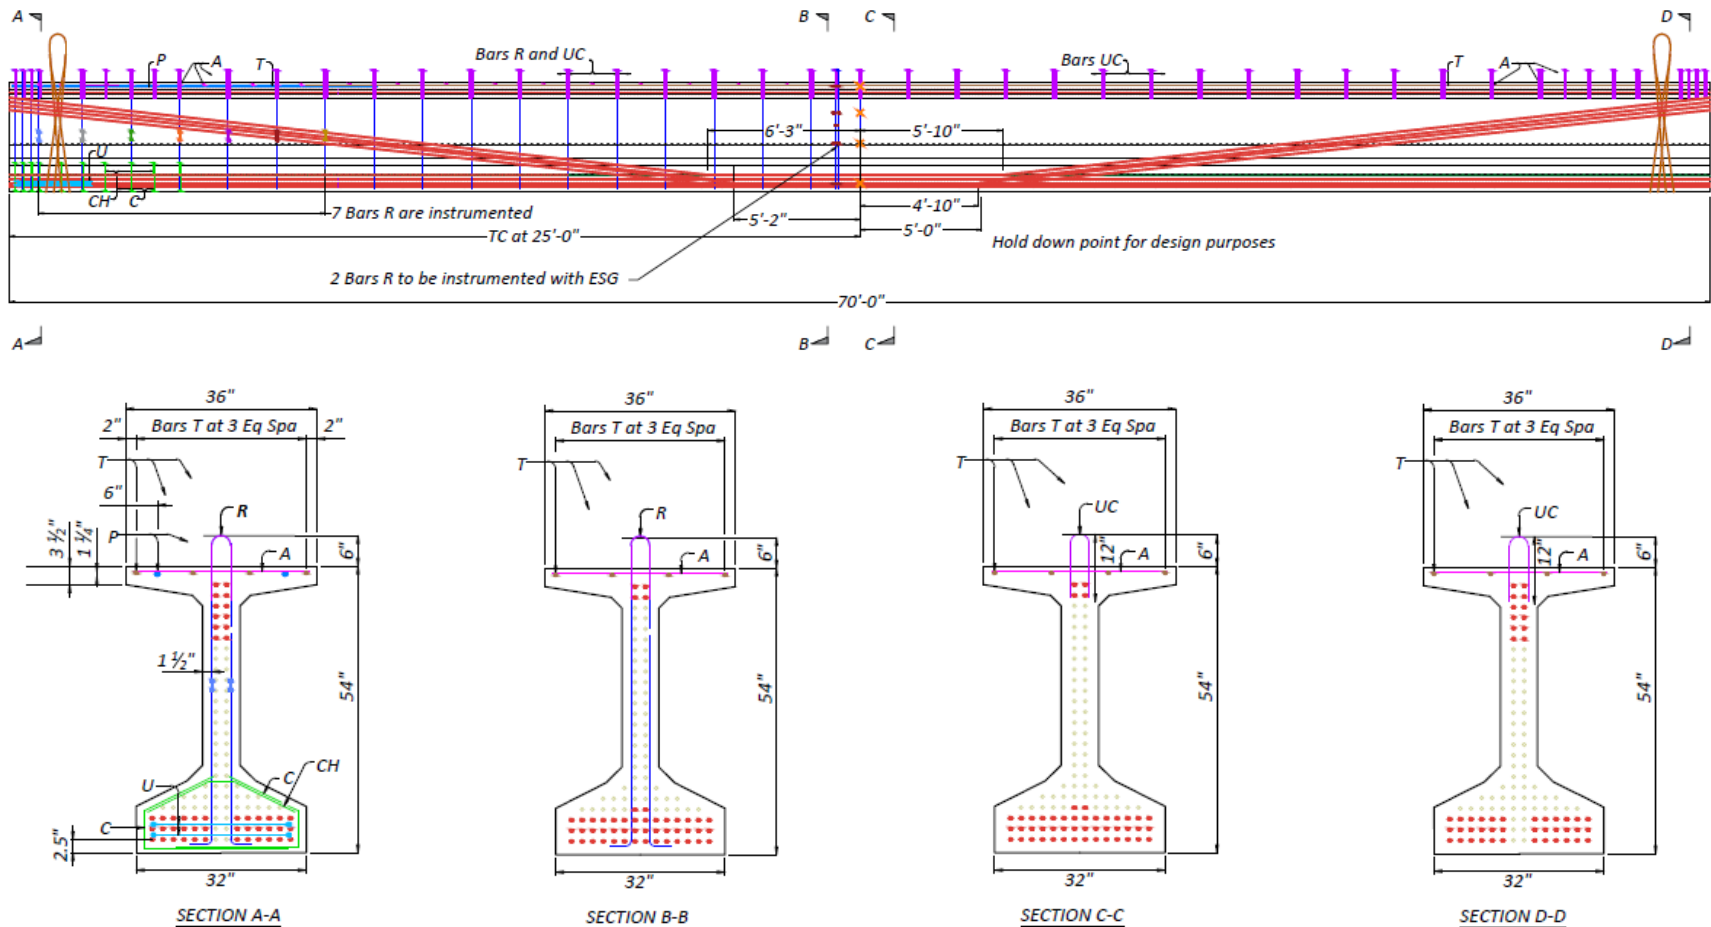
Tx34-1 Structural Design Drawing of Elevation and Cross-Sections.
